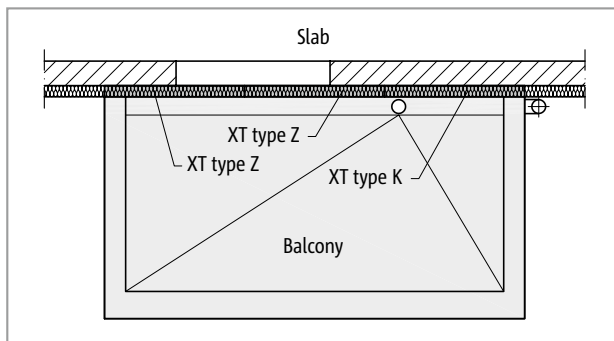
Schöck Isokorb® XT type Z, K: Block-out for drainage with Schöck Isokorb® XT type Z
